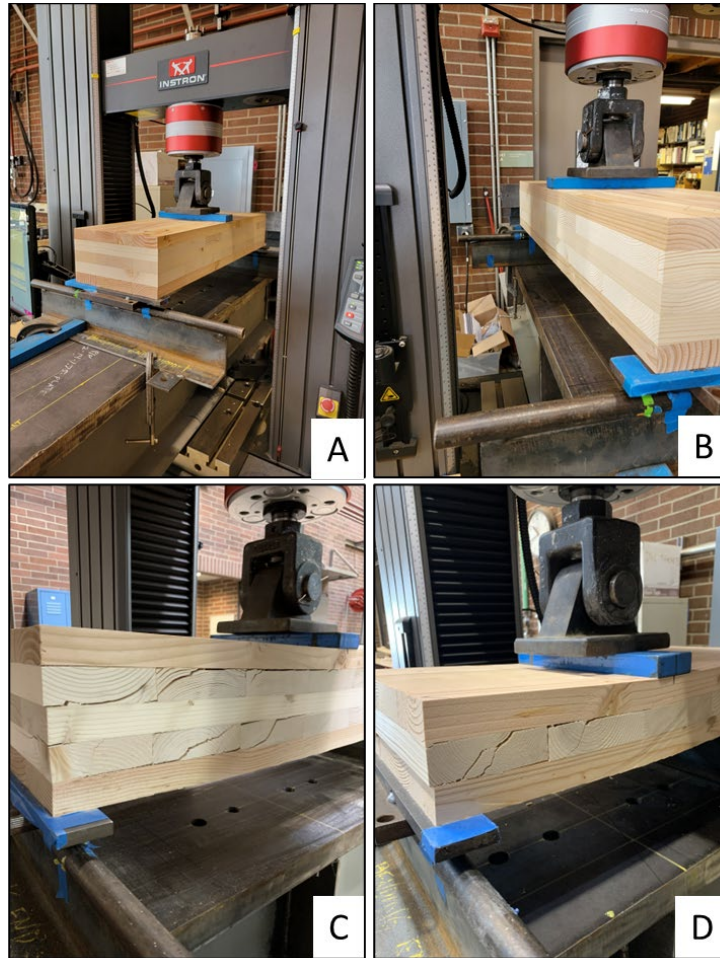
(A&B) Short-span shear test setup; (C) 5-ply shear failure; (D) 3-ply shear failure.
